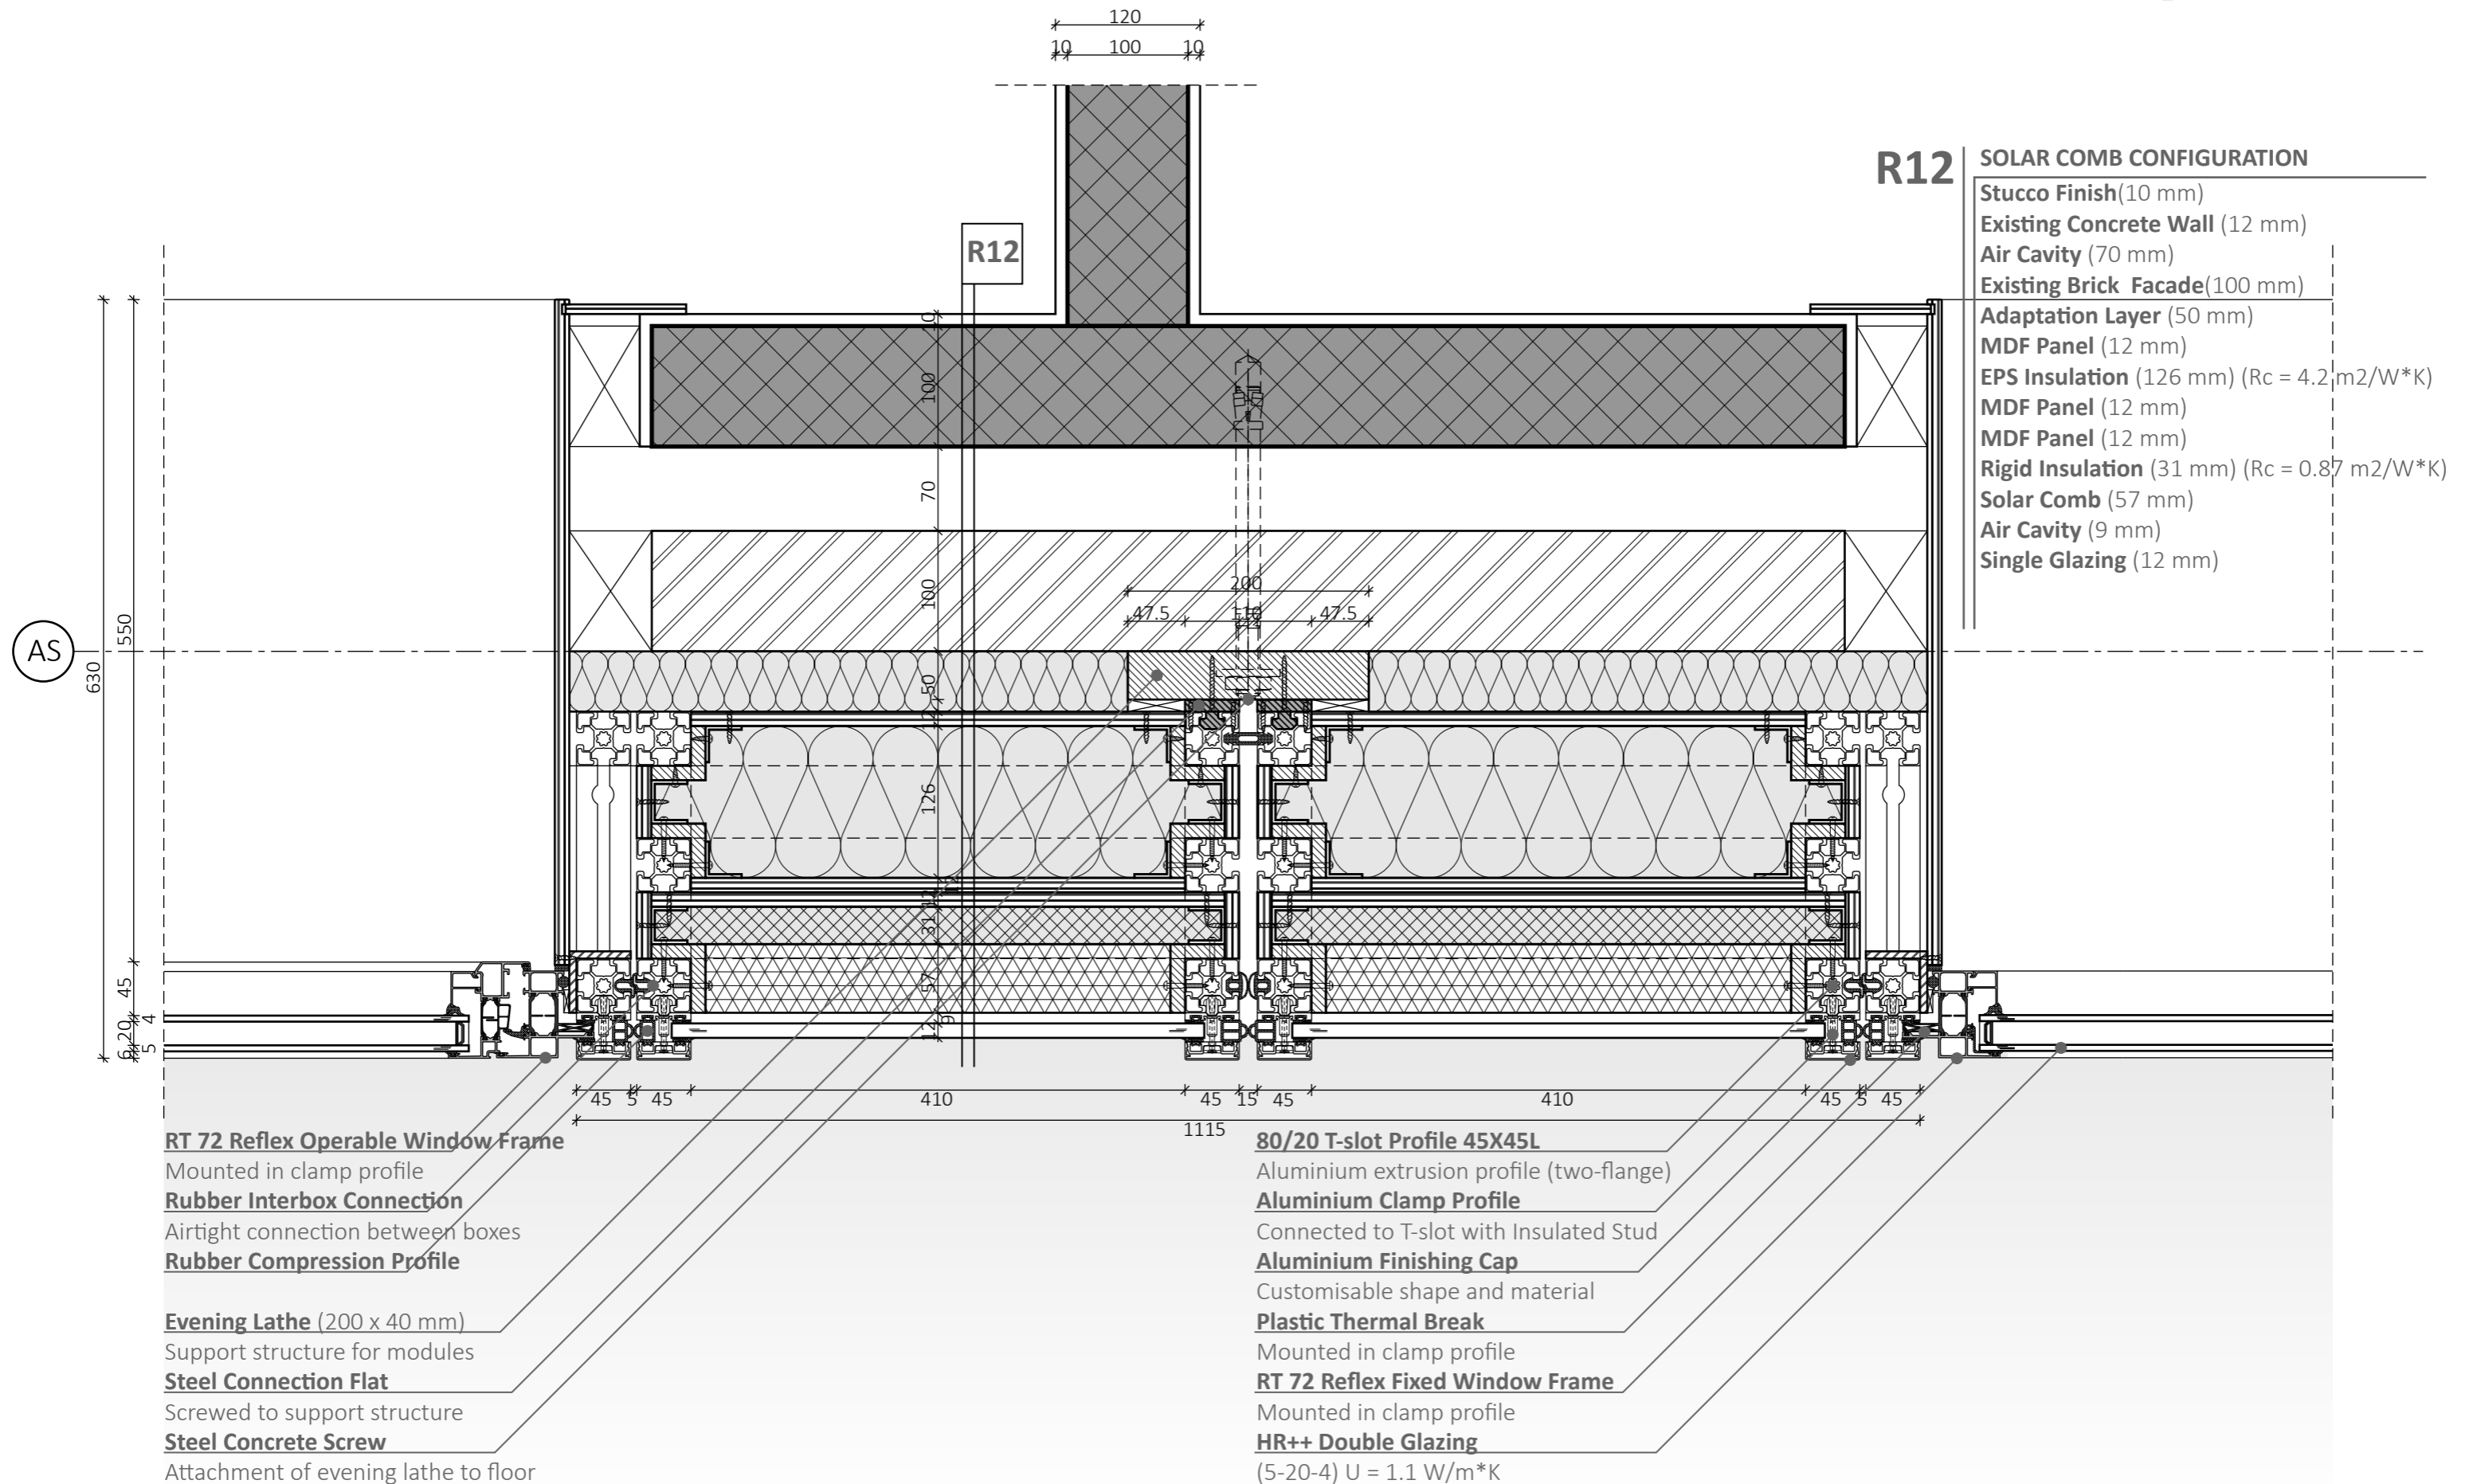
Detail | 1:5 | Horizontal | Solar Comb
